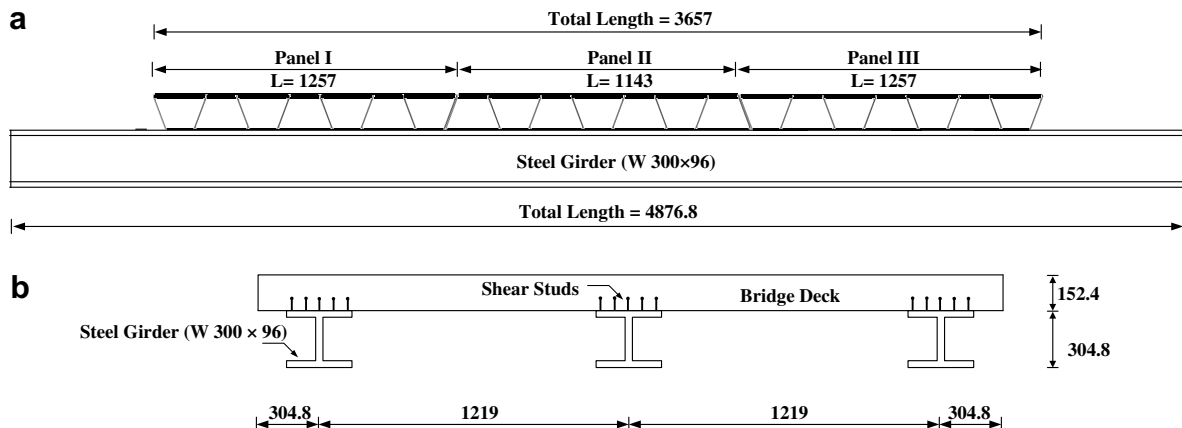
3/4 scale model of steel bridge with a hybrid FRP-concrete bridge deck (units in mm) (a) elevation and (b) side view.
